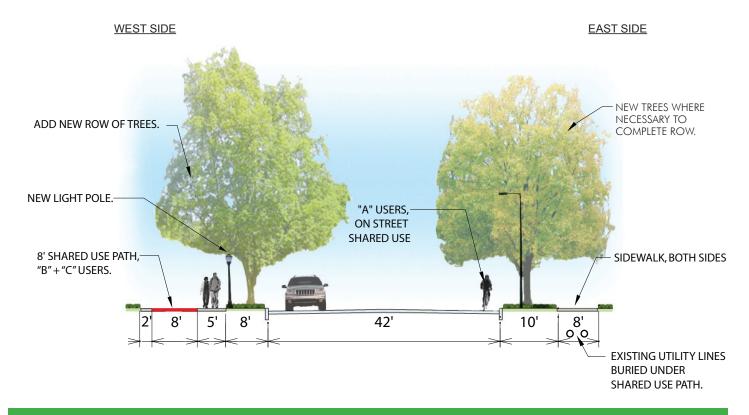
The Hub: Zone 11 3rd Street - Eastern Parkway to Central Avenue
